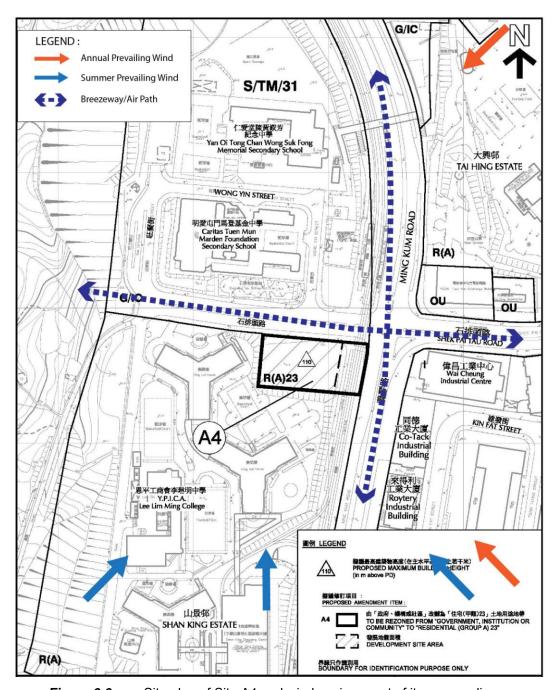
Site plan of Site A4 and wind environment of its surroundings
